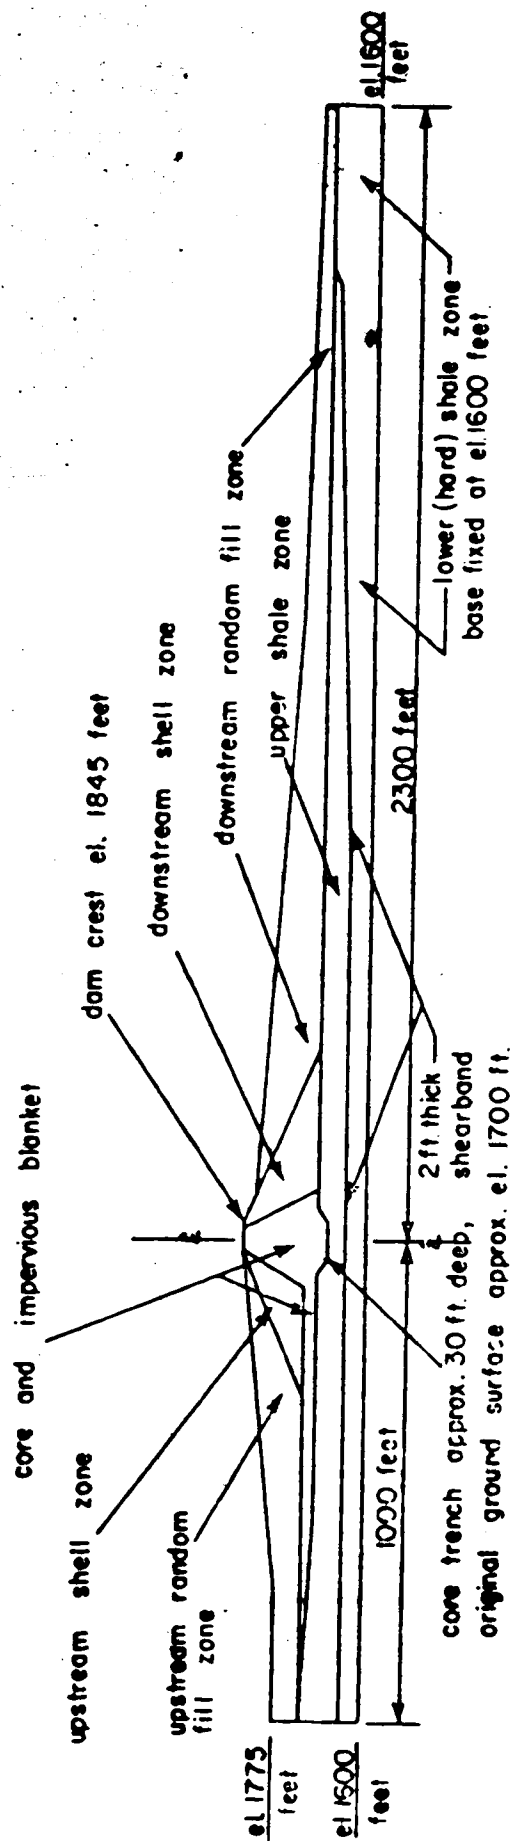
ADOPTED CROSS-SECTION, COTEAU CREEK STA. 169+50
